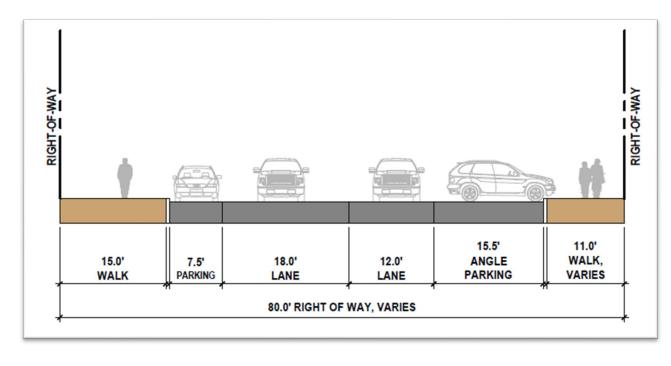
4th St - Existing Cross-Sections Between Ute Ave & Colorado Ave
